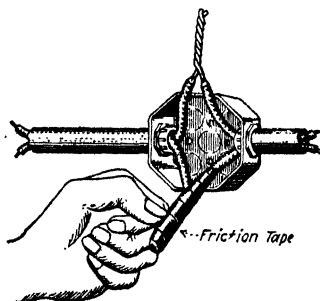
“Finishing up” a taped joint. Friction tape covers all rubber tape.
